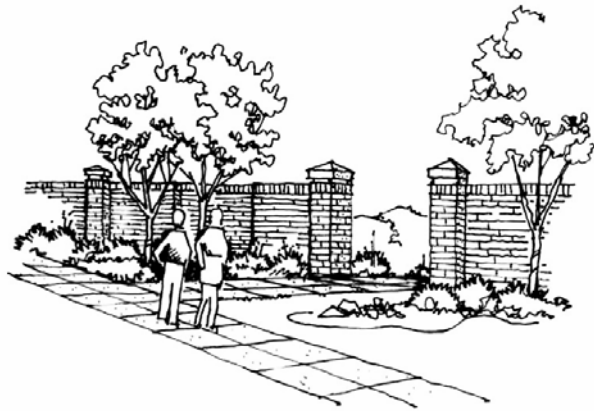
The maximum length of continuous, unbroken, and uninterrupted fence or wall plane shall be 50 feet. Breaks shall be provided through the use of columns, landscaping pockets, transparent sections, and/or a change to different materials.
